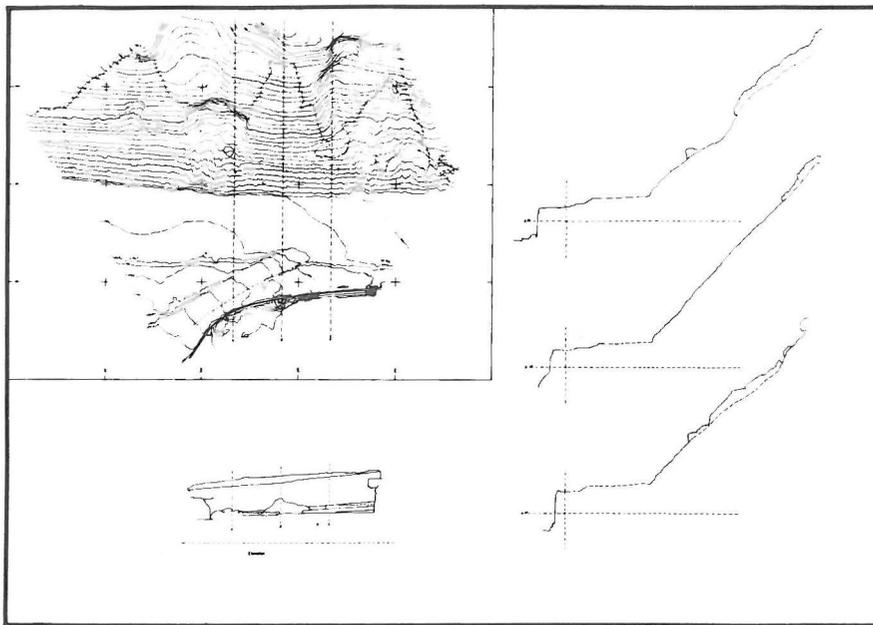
CONTOURED PLAN AND DRAWING OF THE AREA SHOWN IN PLATE 1
